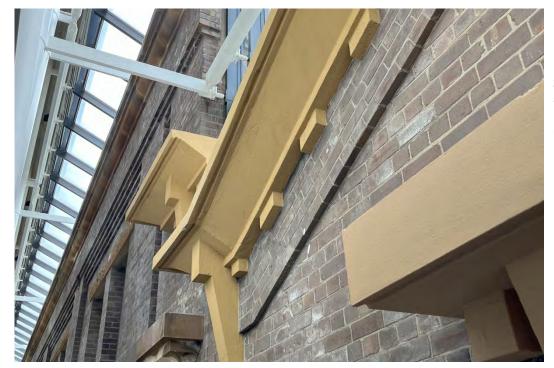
Detail of the interface between the Switch House and the Wran Building roof (Vault 1)
